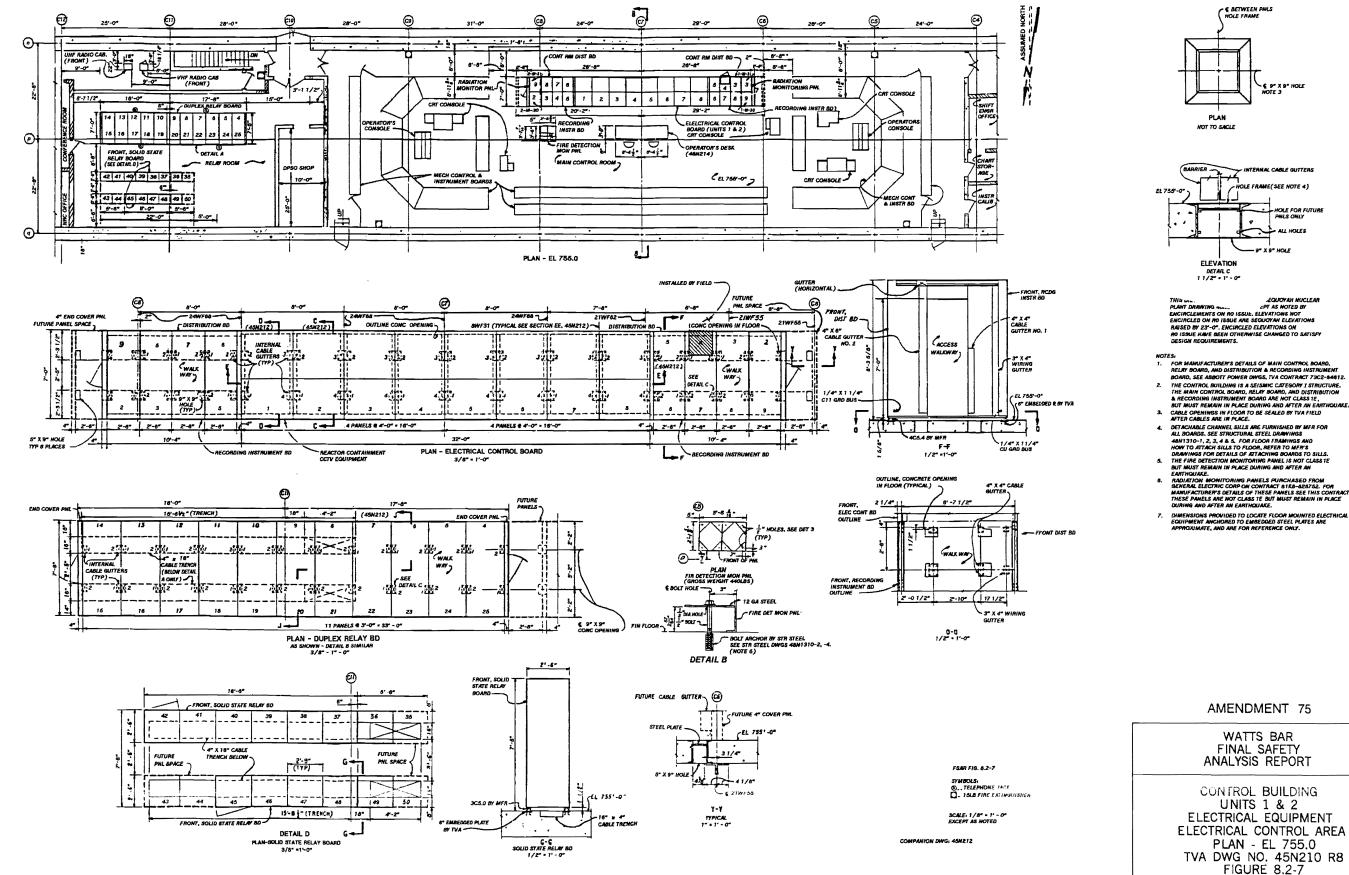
Control Building Units 1 and 2 Electrical Equipment Electrical Control Area Plan - EL. 755.0
